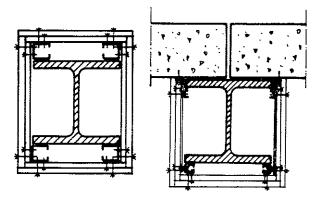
b. Sketch showing fire insulation of columns and floor girders with two layers of 13 mm gypsum plaster slabs. On the girder, the sections of metal sheeting are suspended on steel straps attached to special sections fixed in the precast floor units
